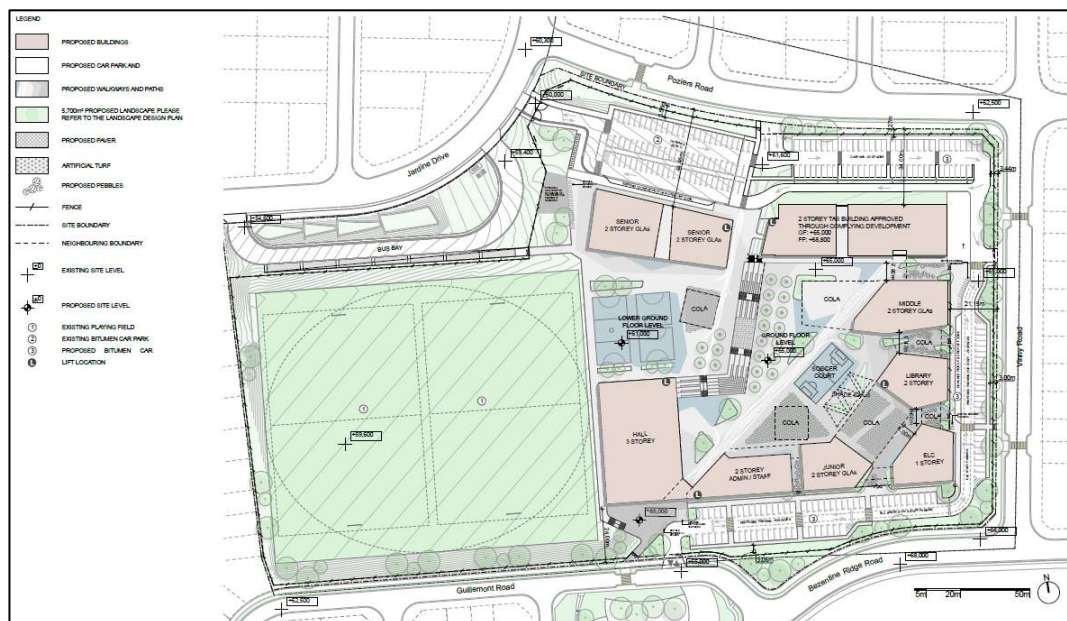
Master Plan - Ground Floor (RL +65,000) (Source: JDH Architects)
